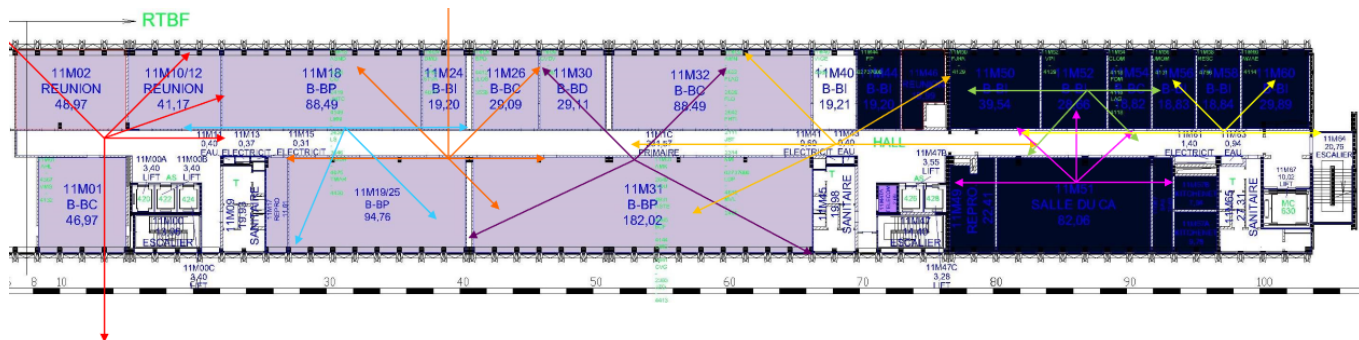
Design at 5 GHz for Floor 11 in Building CHJM
